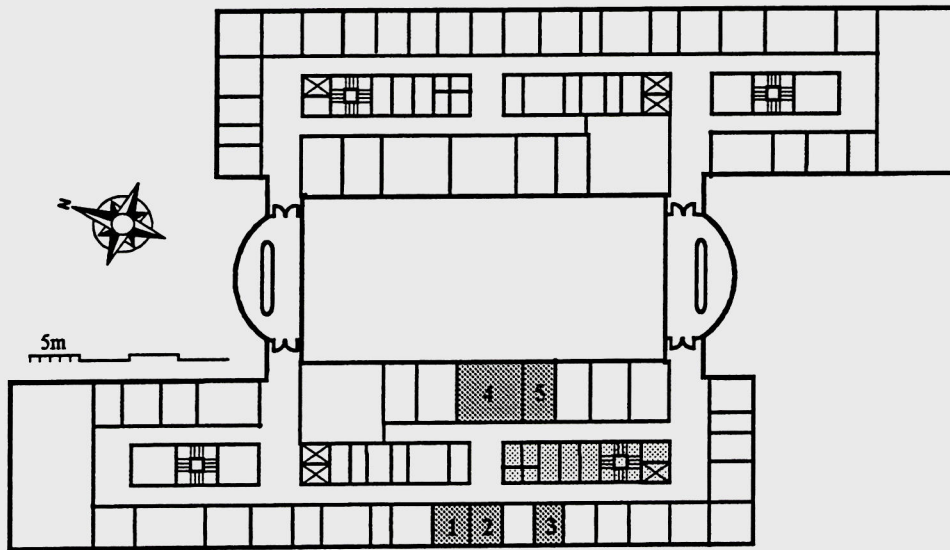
Building D: plan of building. The 5 floors are very similar. Measured zones are in grey. Special measurements were performed at locations 2 and 4.
